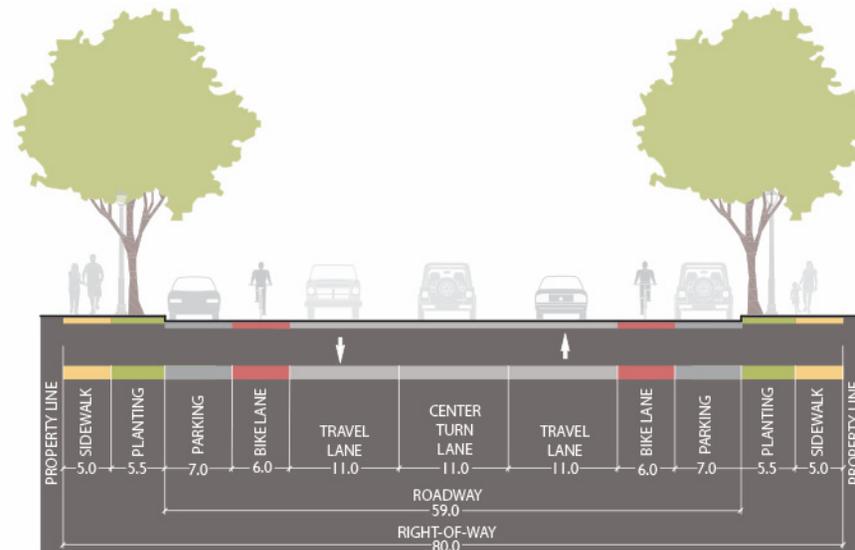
5th Street Between 1st Avenue and Crate Avenue
